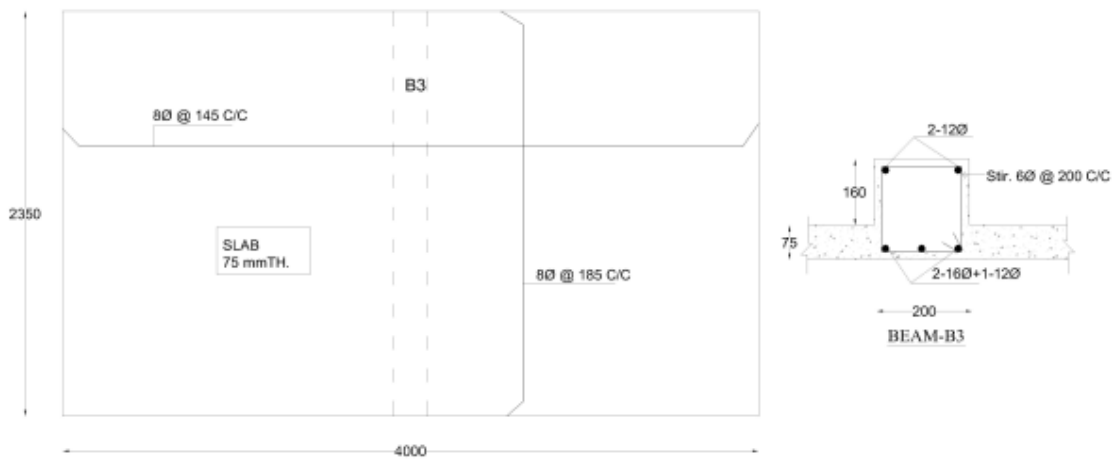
Reinforcement Detailing of Slab, 2PNS
